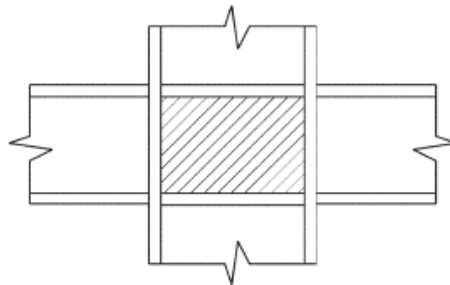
Web Panel Framed by Flanges and Stiffener
